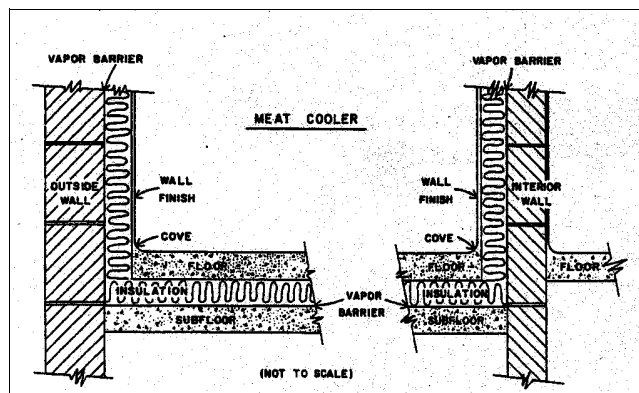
Suggested method for constructing refrigerated room walls and floor.
